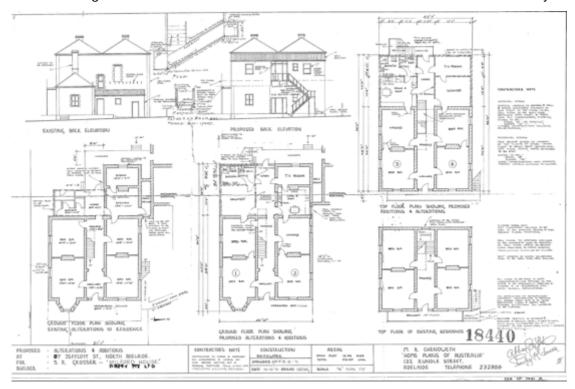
Alterations and Additions to Existing Dwelling 1970-71 Source: Owner
